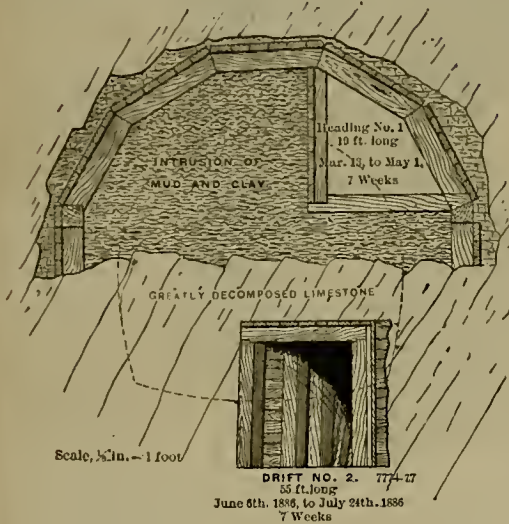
FIRST STAGE OF WORKING IN BAD GROUND.
